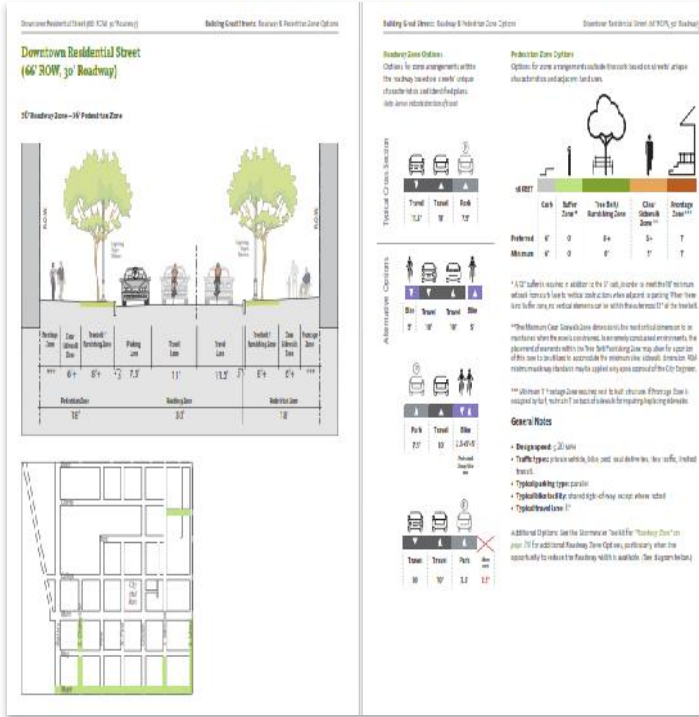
Maple Street Conceptual Cross Section, Pg.78 & 79
